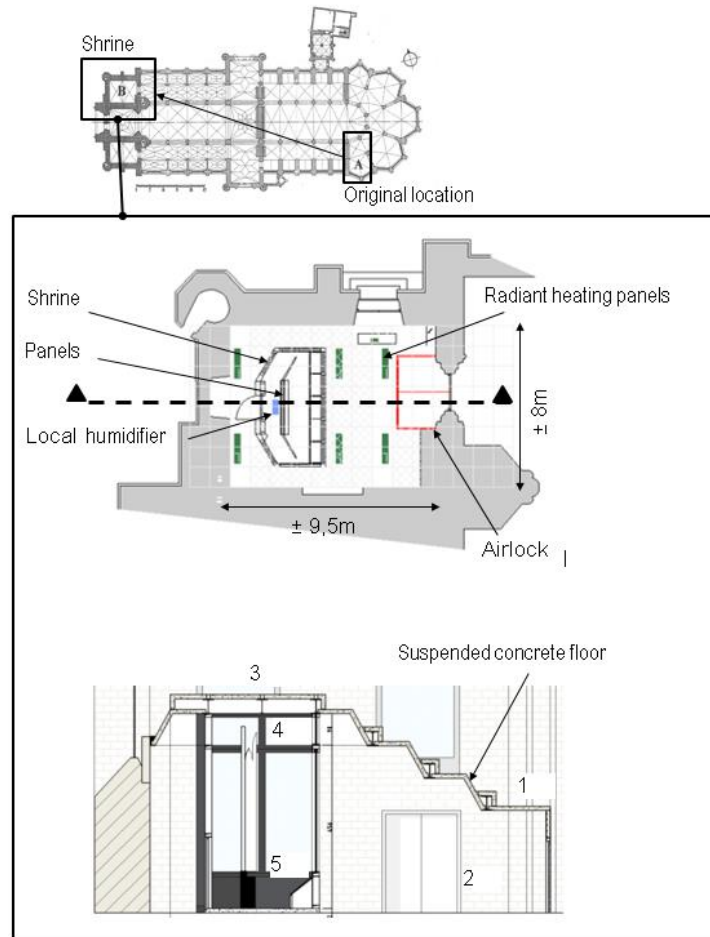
Floor plan of the Saint-Bavo Cathedral with location of the altar piece since 1986 (B). Floor plan and cross section of the baptistery and the shrine, located on the ground floor of the West tower. Location of the loggers (1-5) are indicated on the cross section.
